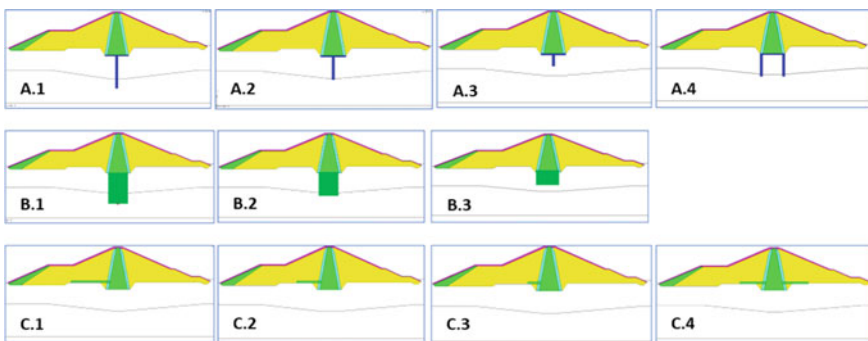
a Extended cut off wall. b Extended curtain grouting. c Extended upstream blanket
